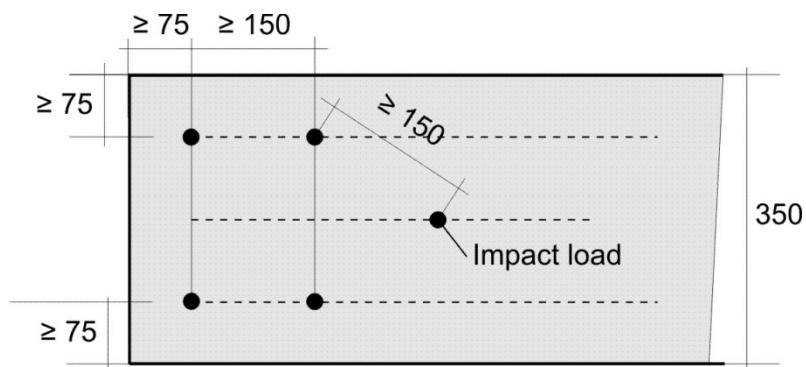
Target areas for waterproofing membranes in plan view (dimensions in millimetres)
